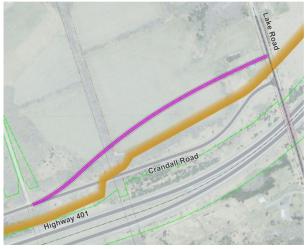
Crandall Road Realignment Sub-Alternatives for Section 3
